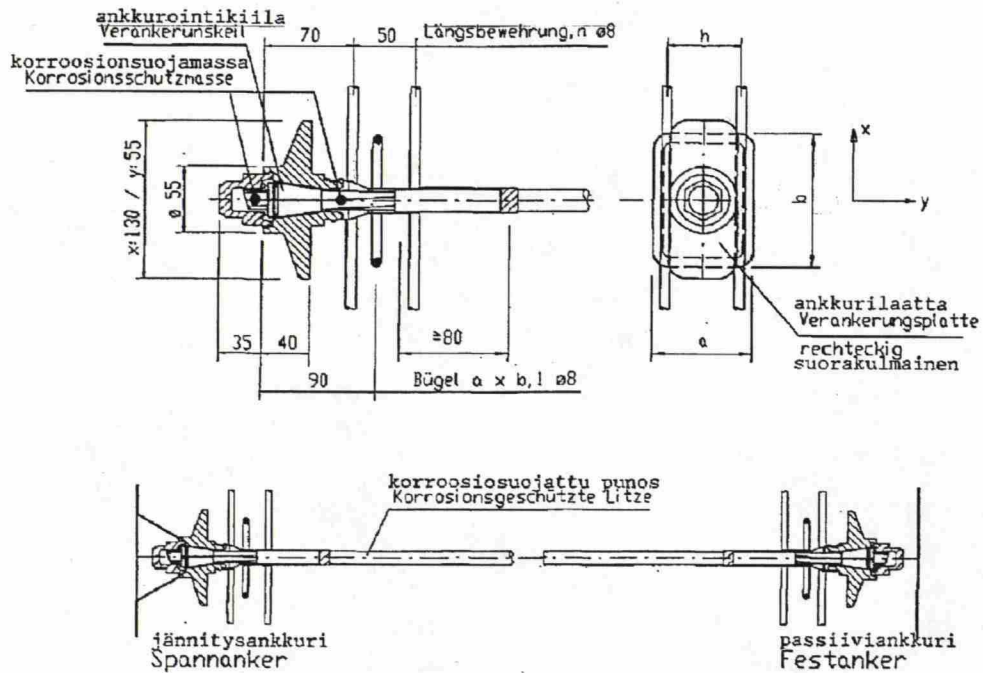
The anchor dimensions and anchorage zone reinforcement [24].
